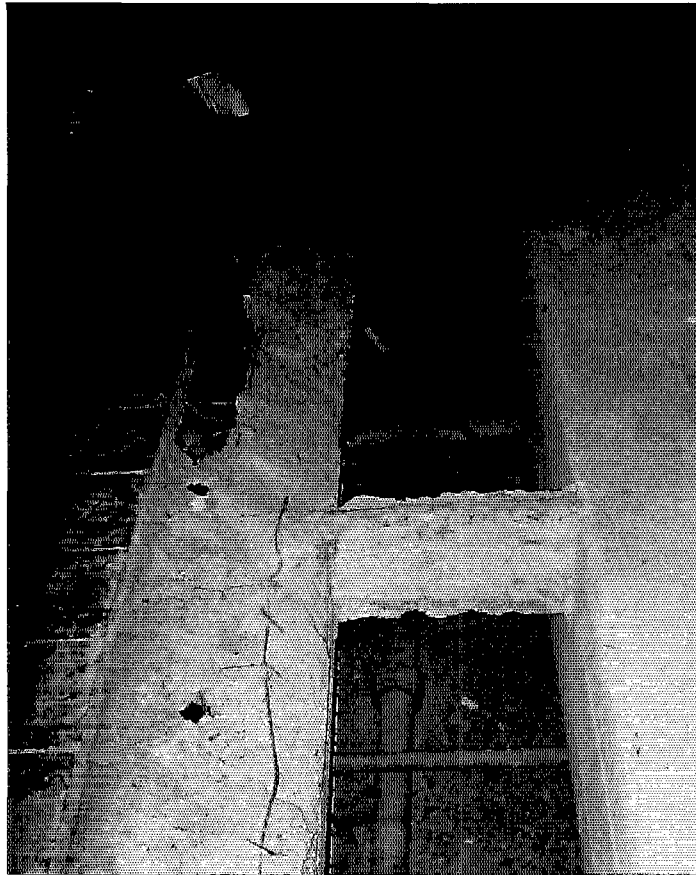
Void underneath concrete removal area, Building 84A UL#01
